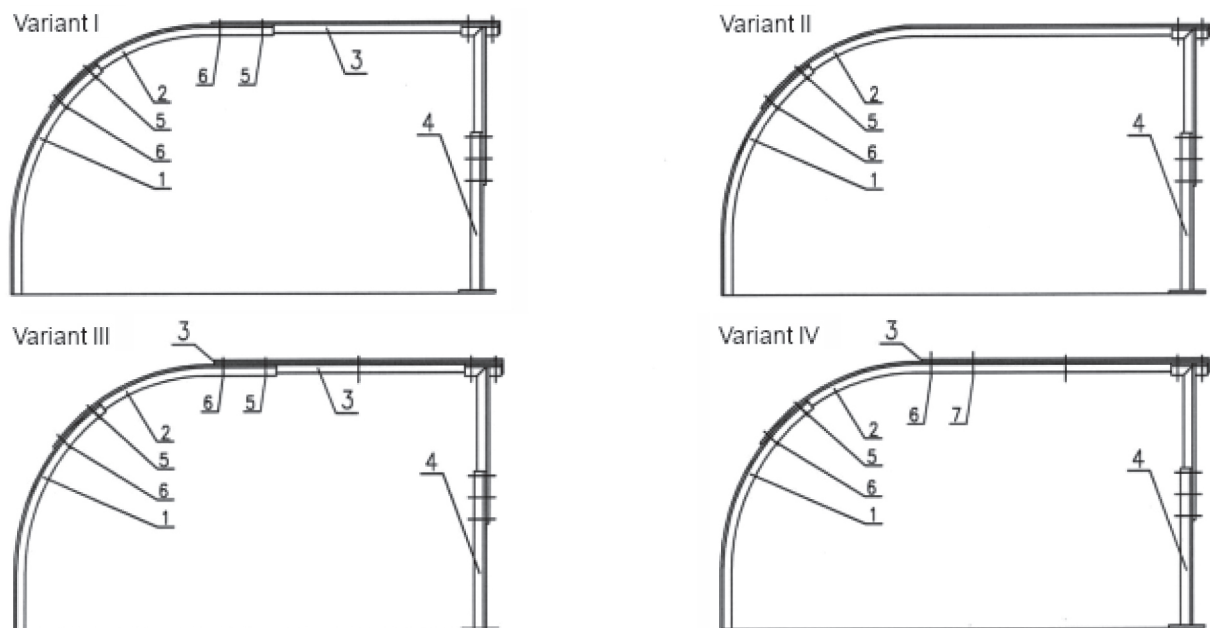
ŁPro/B frame: 1 – side section, 2 – upper side section, 3 – straight top section, 4 – prop (supporting element), 5–7 – shackles
